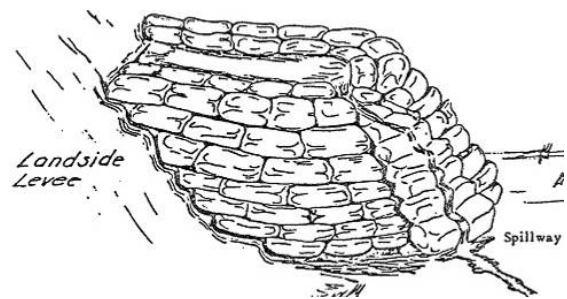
Sketch of ring levee tied to a levee slope, with spillway. Construction against the levee slope results in a U-shaped sandbag "chimney."
